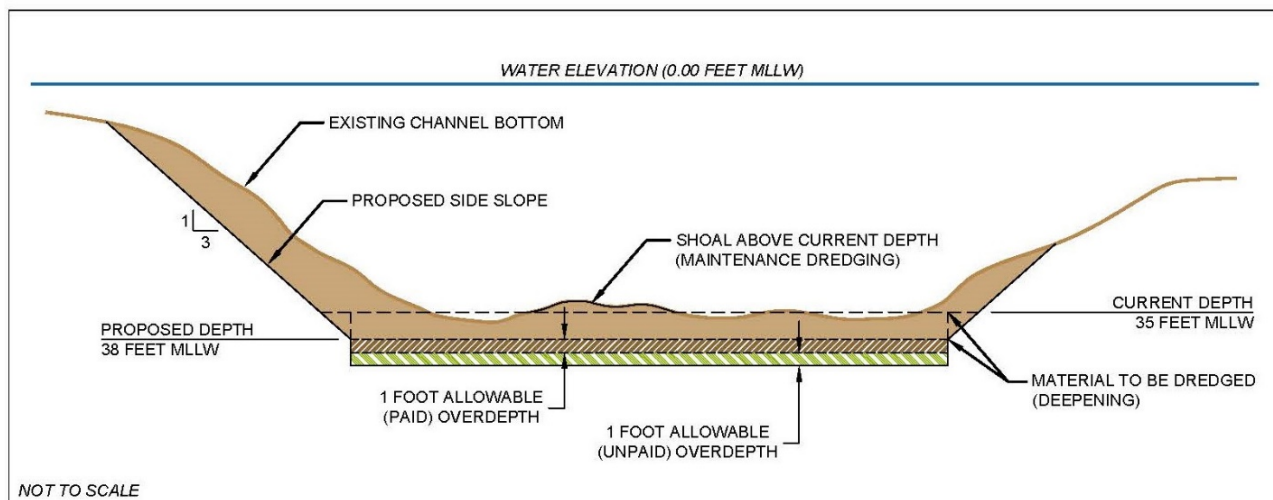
Typical Cross Section of a Navigation Channel Where Dredging Would Occur
